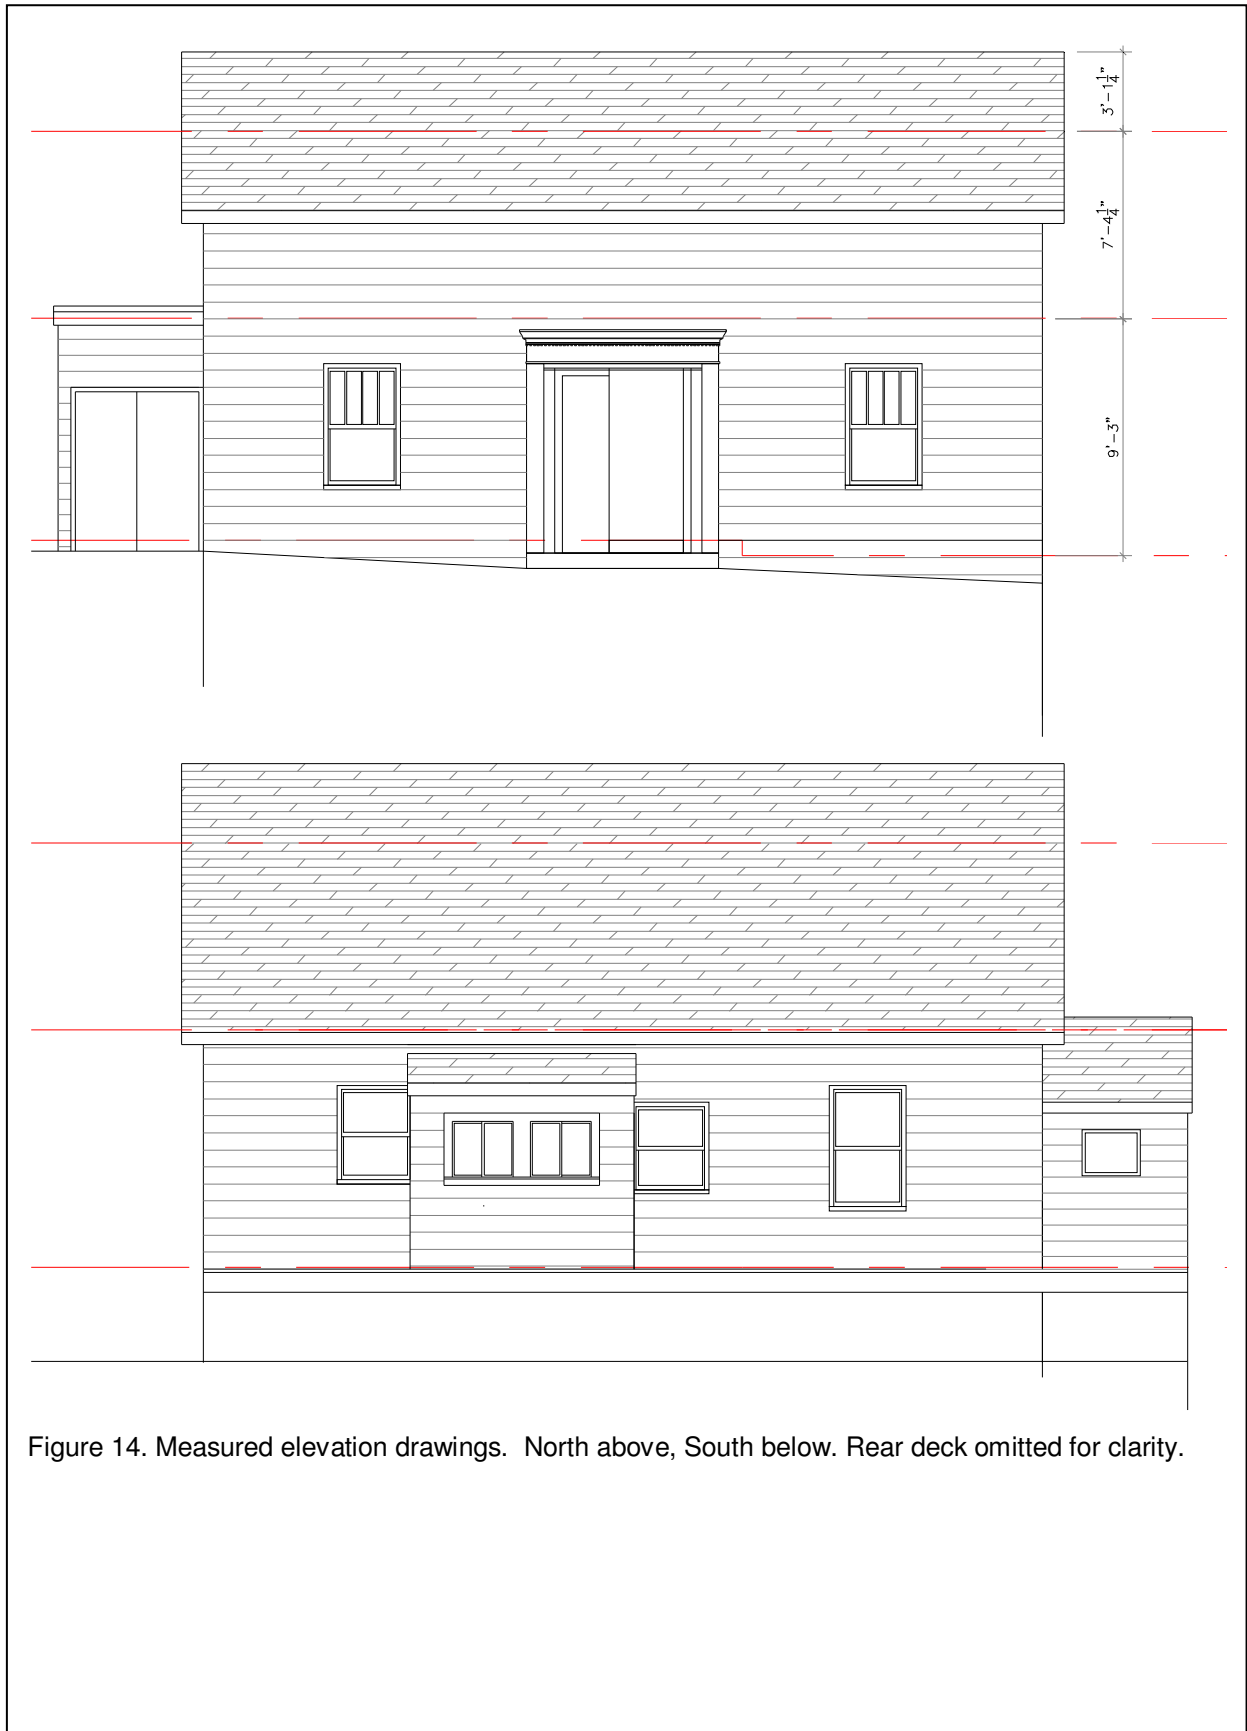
Measured elevation drawings. North above, South below. Rear deck omitted for clarity.
